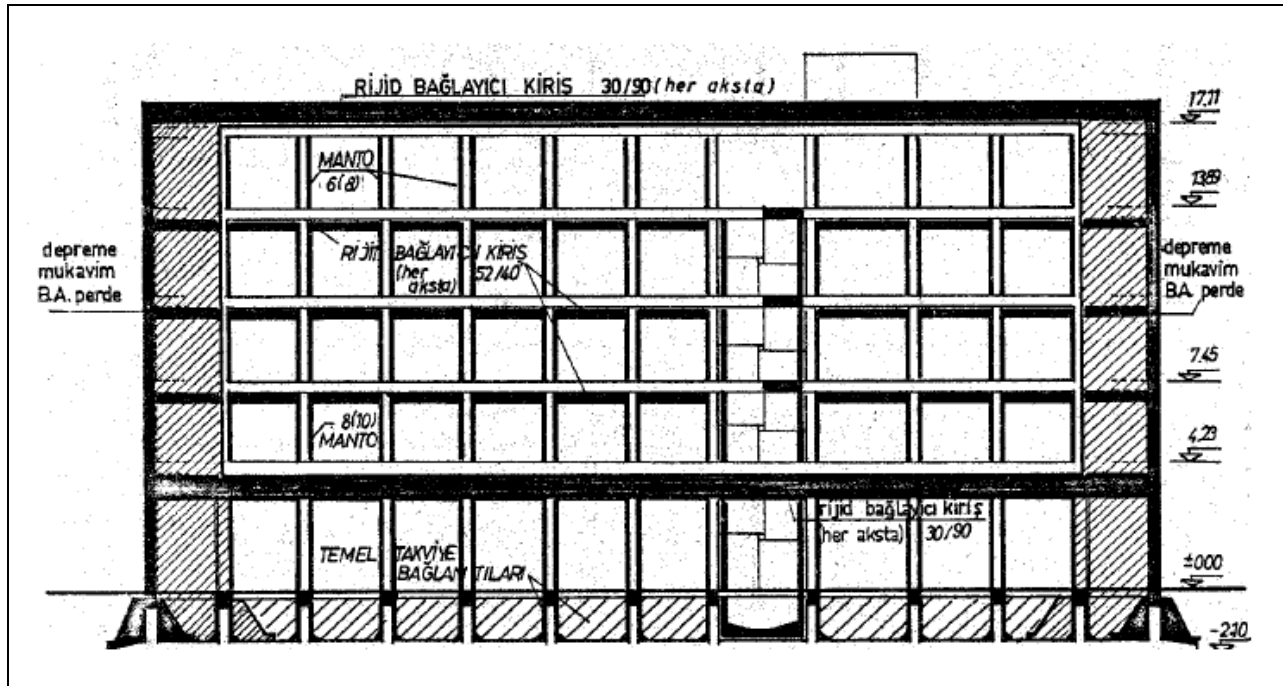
Front elevation after the retrofit in 1968 (Anadol et al. 1972)
